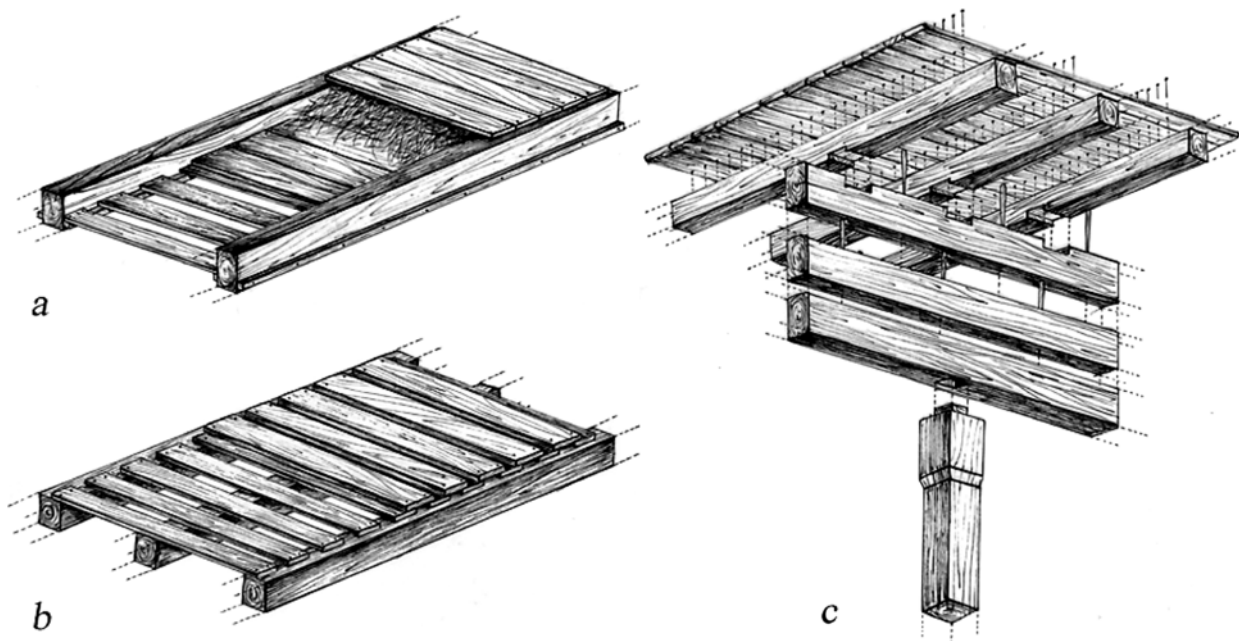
Examples of interior wooden ceilings (designed by L. Berežanskyté)
